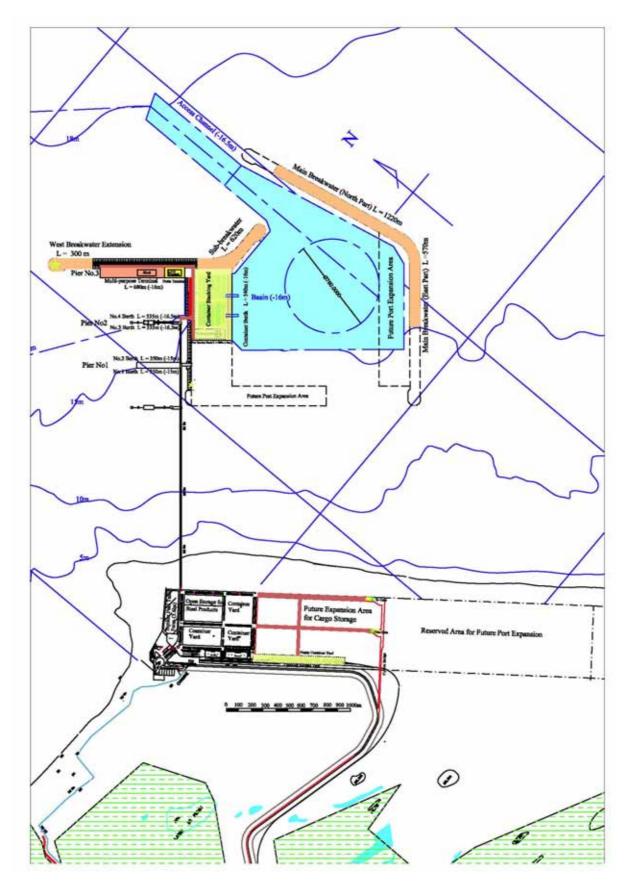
Facility Layout Plan in the Short-Term Development Plan
